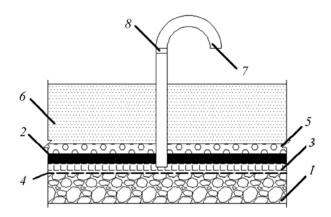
Node A of exhaust pipe design; 1 – body of spoil heap; 2 – waterproof layer; 3 – gas drainage layer; 4 – separating geotextile material; 5 – water drainage layer; 6 – protection ground layer; 7 – exhaust pipe; 8 – non-return valve
